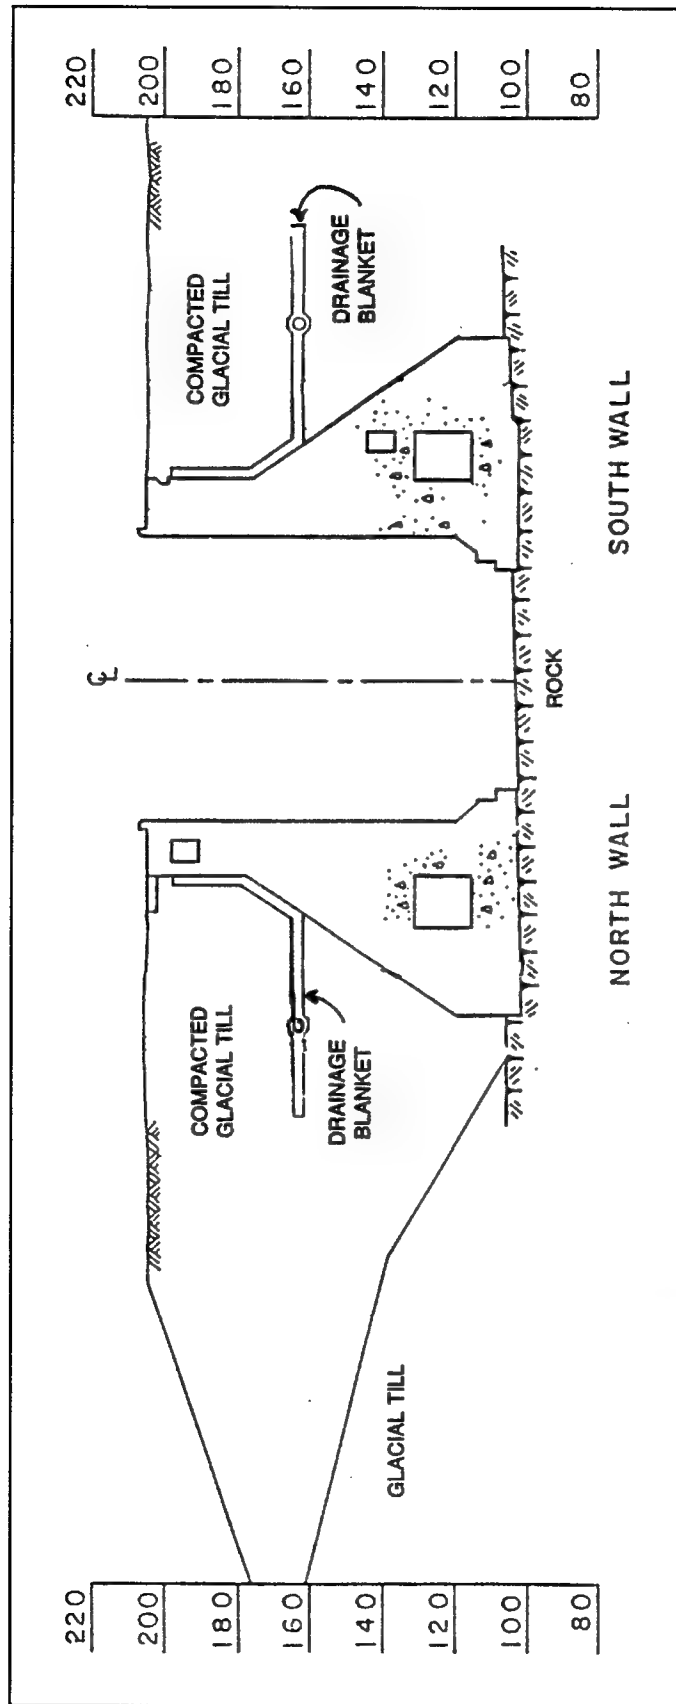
Typical cross section through the chamber at Snell Lock (elevations are in feet referred to the National Geodetic Vertical Datum. To convert to meters, multiply by 0.305 m)
